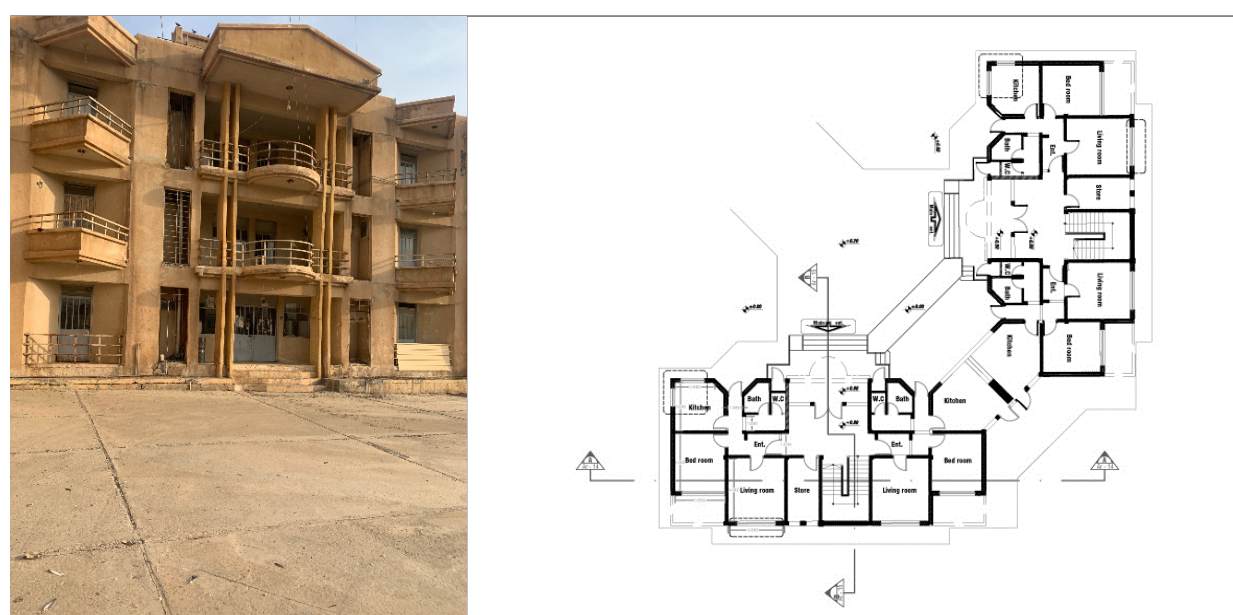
Example of the surveyed apartment buildings (left) and the ground floor plan (right).
